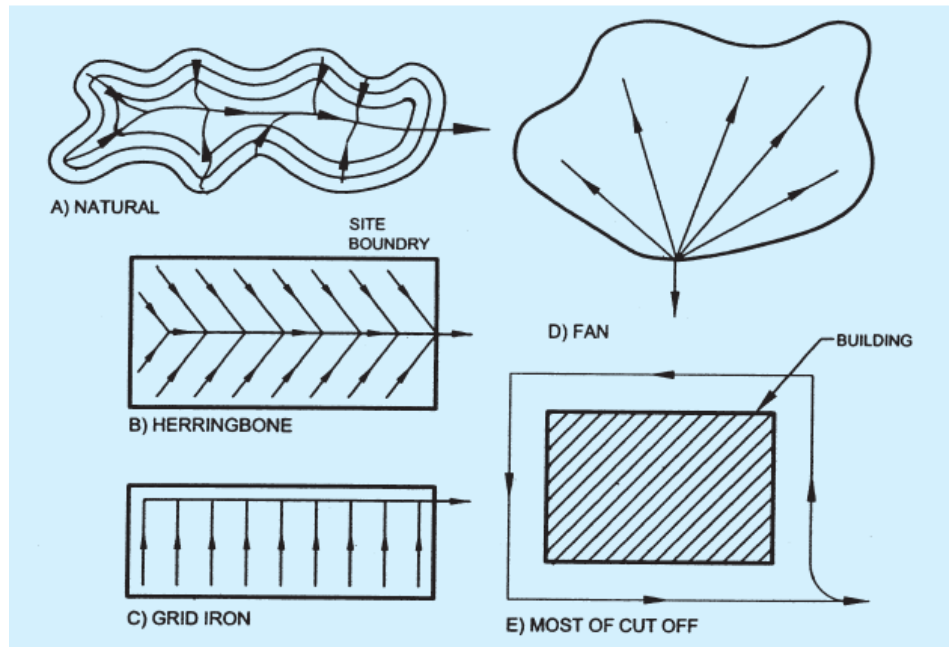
DETAILS OF SUB-SOIL DRAINAGE SYSTEM
